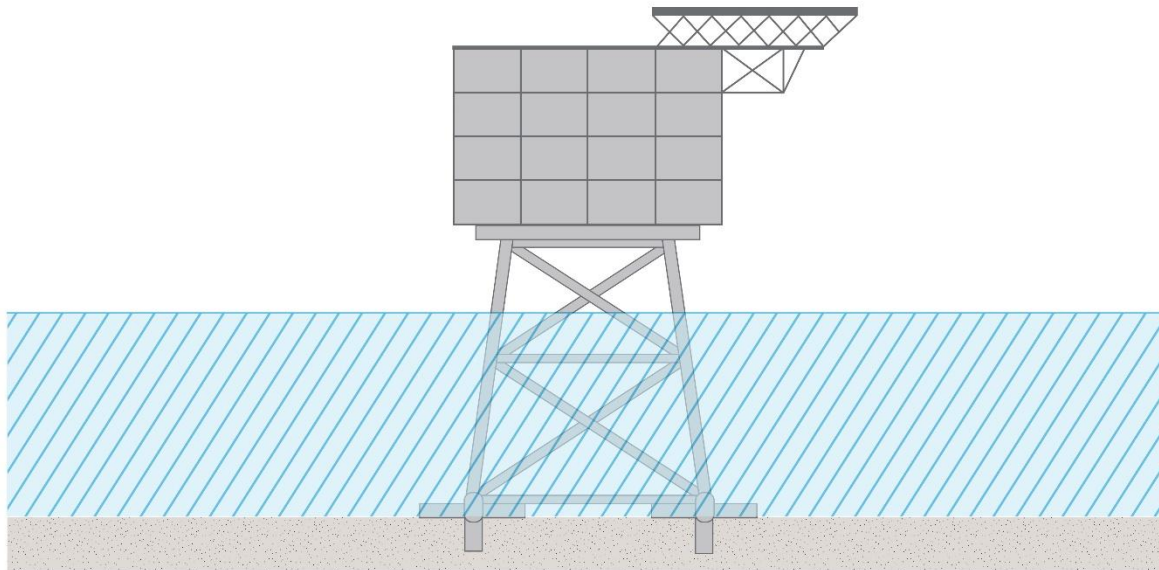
Illustration of a typical Offshore Substation Platform on a piled jacket foundation (not to scale)
